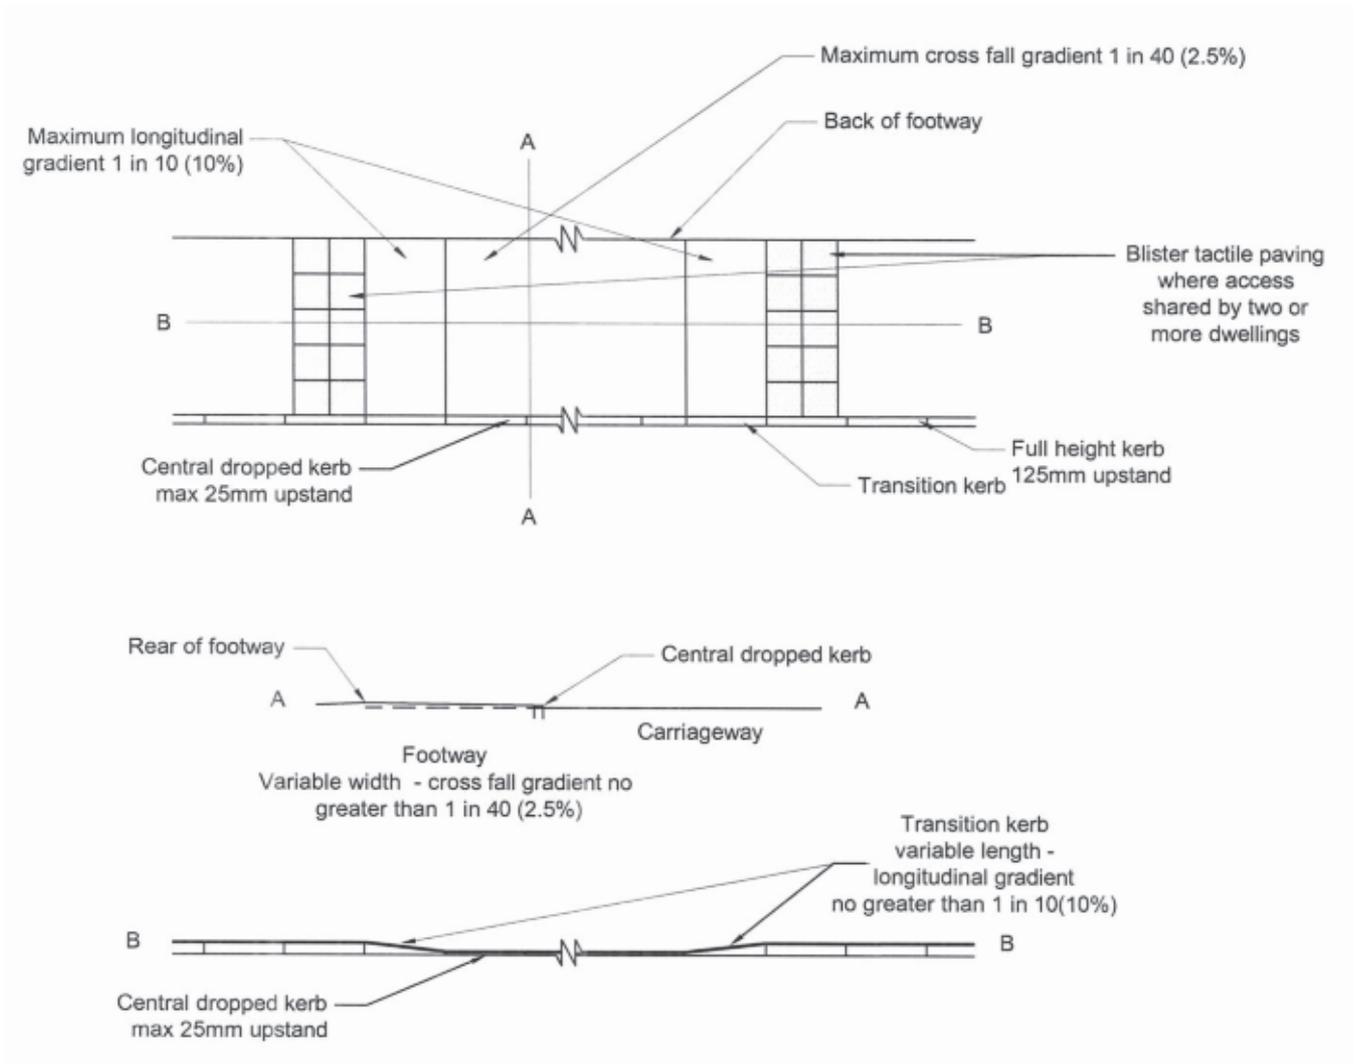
Kerb and tactile paving detail in respect of standard access to 2 to 5 dwellings over footway (only to be used on Class 4 highway or below).
